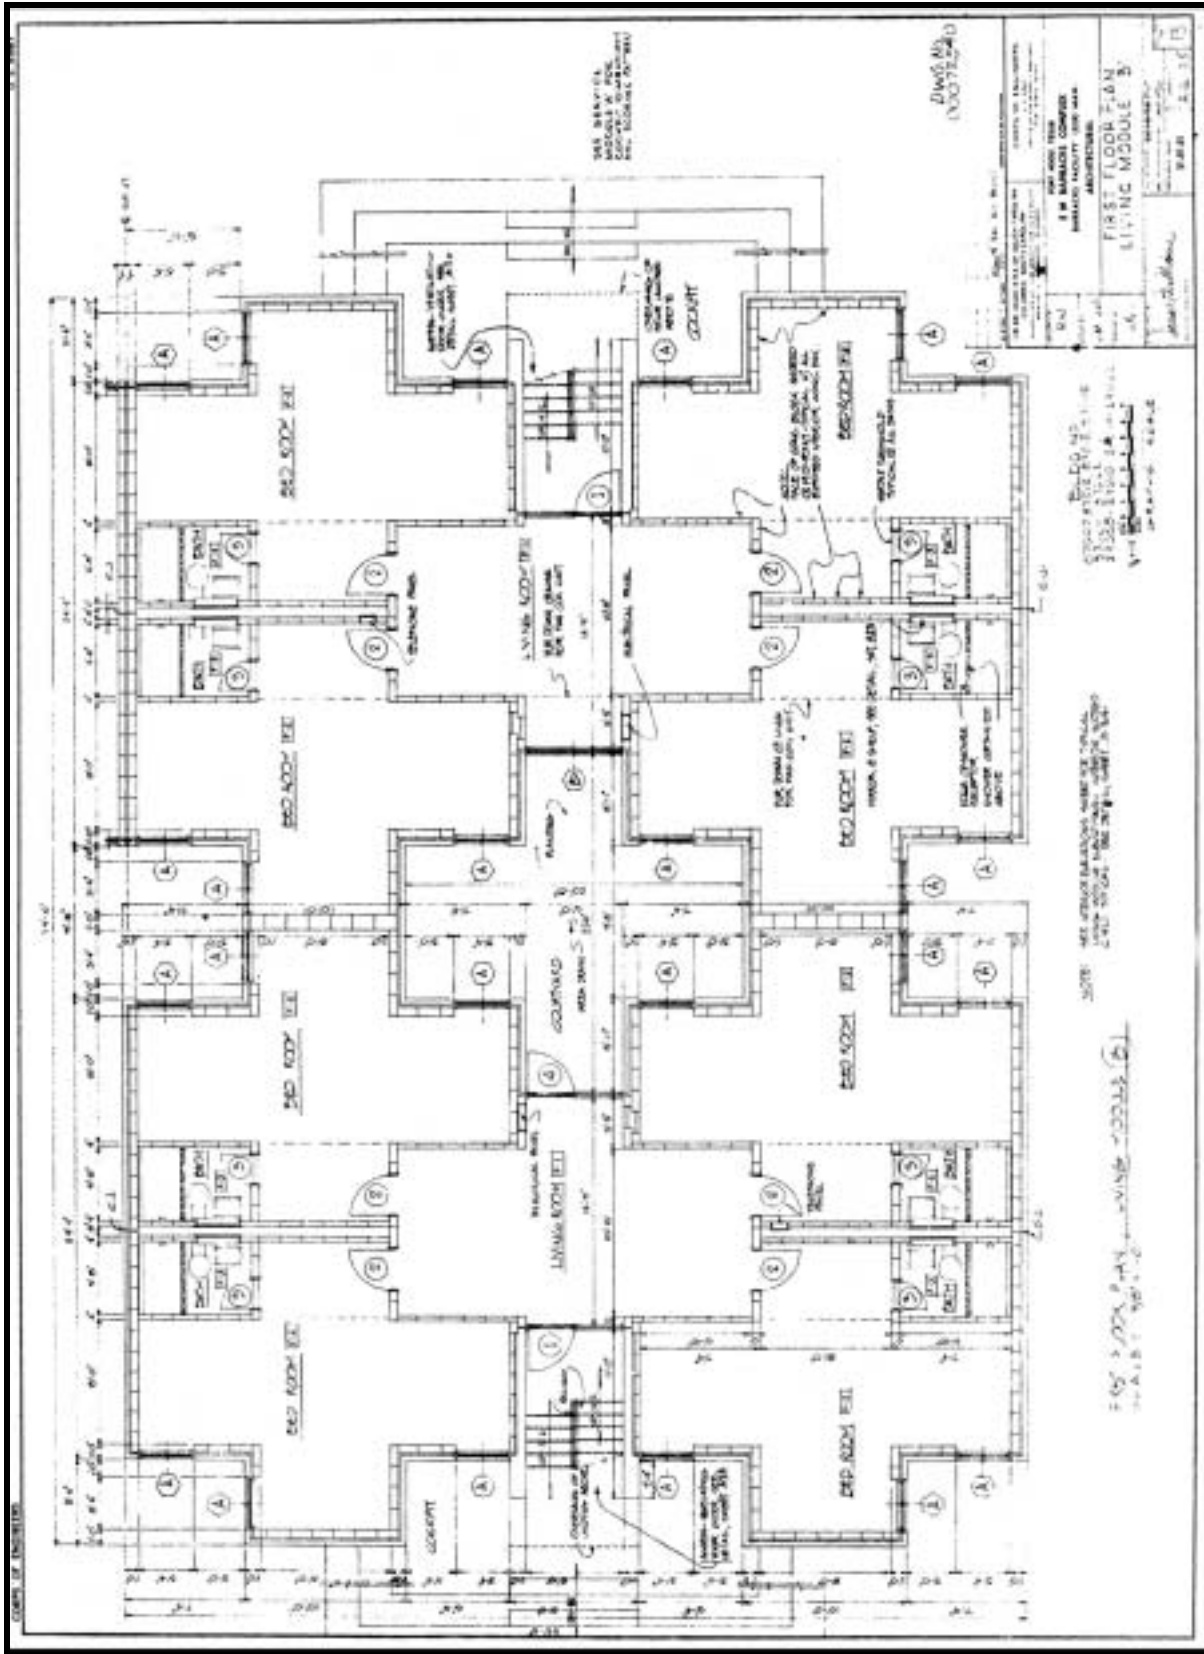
LBC&W barracks living module, Ft. Hood (1972, revised 1975) (Engineering, Ft. Hood).
